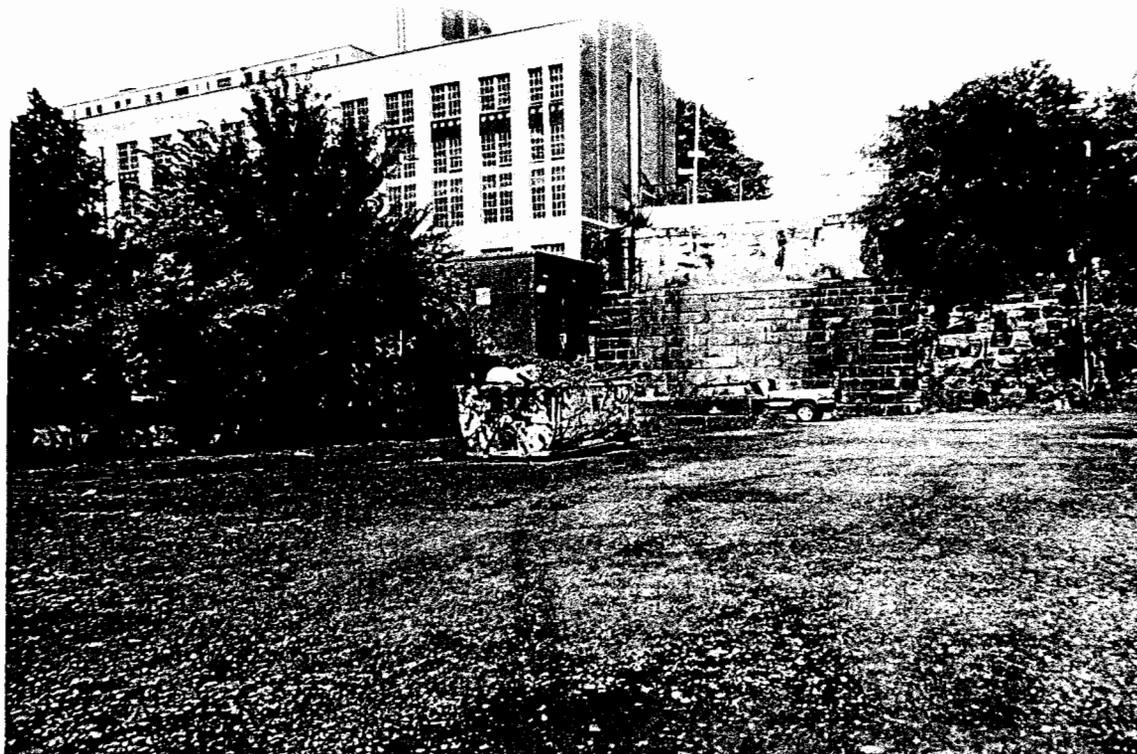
Subject Site-View to West-Metro North Gravel Piles and Stack in Background
